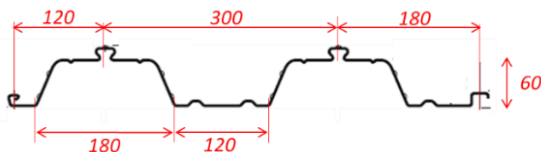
Cross-section of CF60 profiled steel deck with geometric dimensions used in analysis (unit in mm)
